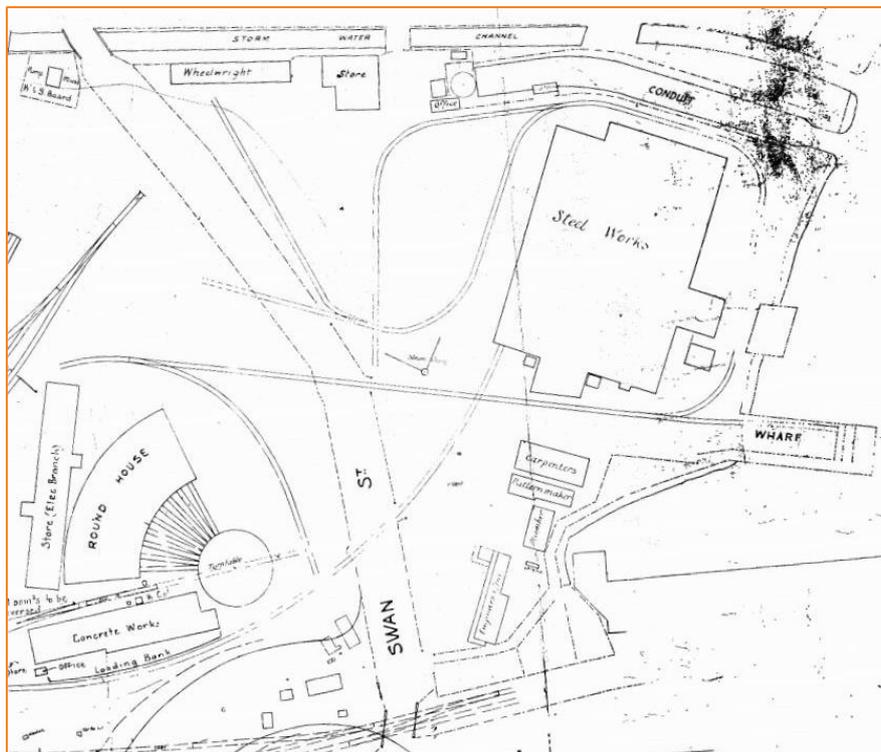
Plan prepared ca 1923 to 1928, showing the White Bay Steel Works as part of the power house site. Swan Street has been deviated by that time, and the water conduit built. Names of buildings are also noted on this plan, as well as sidings and tracks. Source: Transport for NSW Plan Room, 0049125
